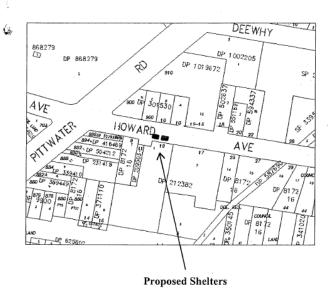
Shelter J7 DA5046 Stamped Plan indicating advertising panel (outlined red)
